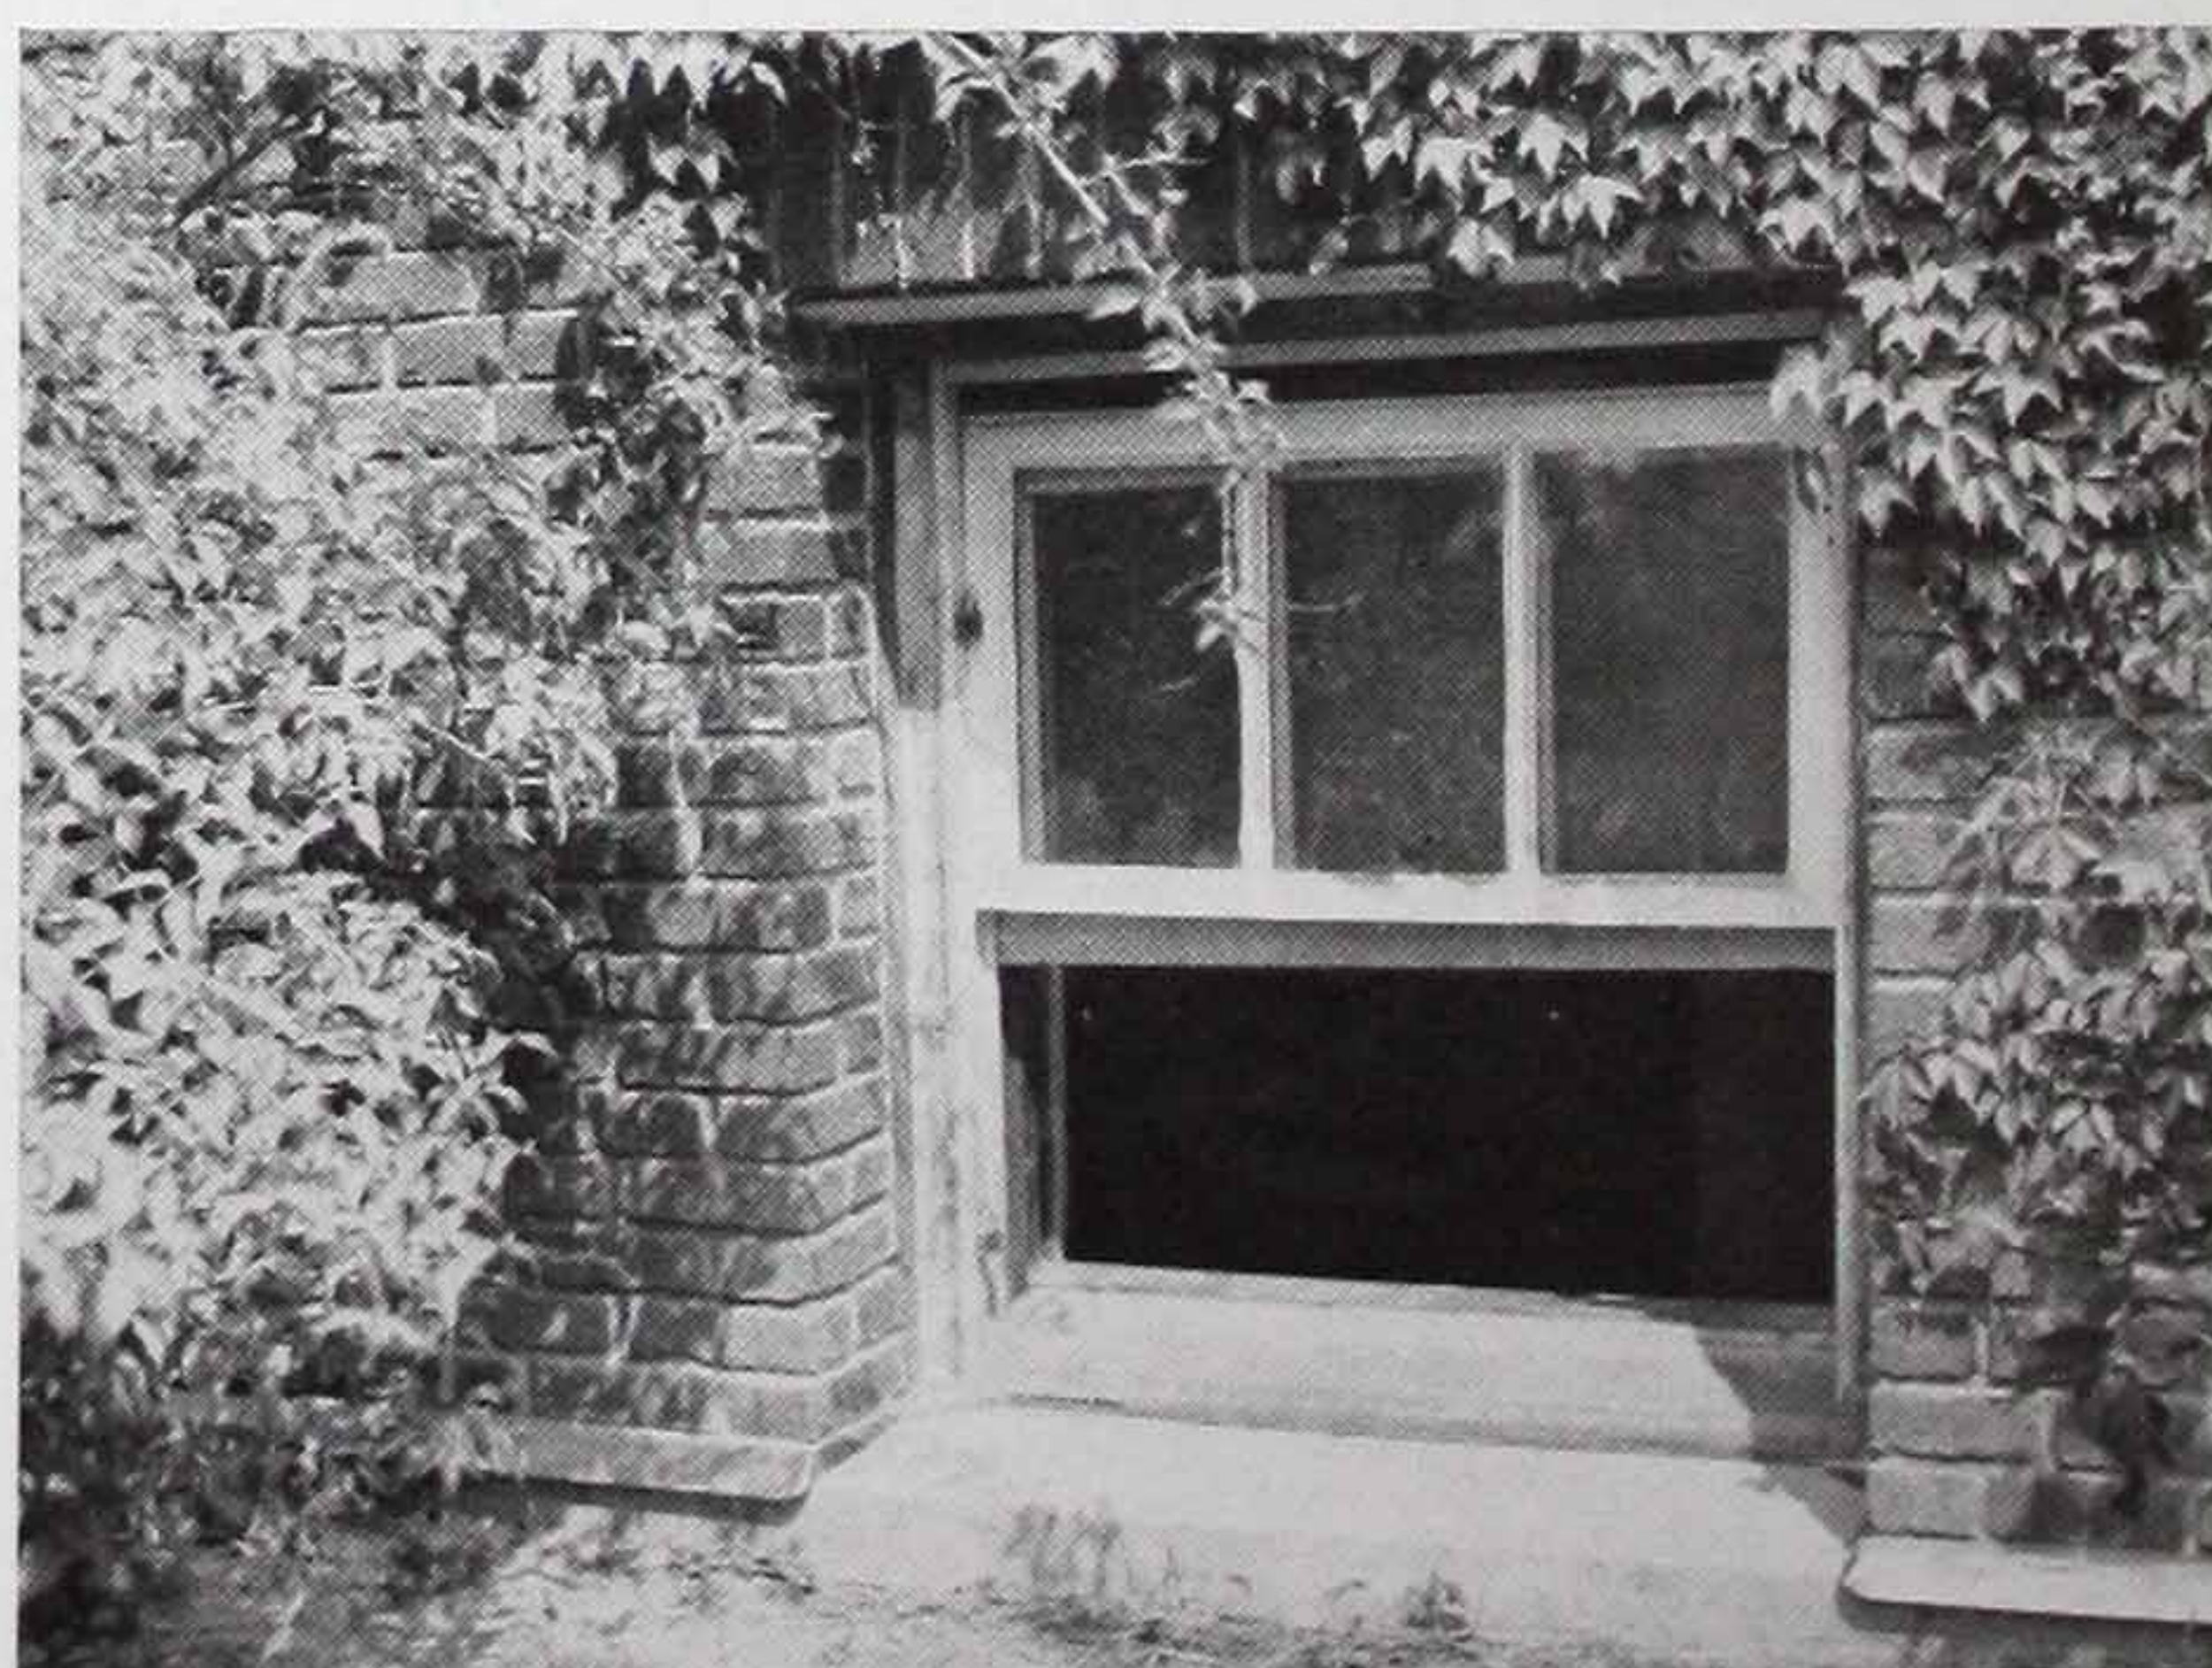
shows details of a typical cellar hatchway. It will be noted that this construction combines Barrier with Partial Deflector type of shield. For where the shield extends vertically it is conceivable that shelter tubes might be built around it. But here again we have a point easy of inspection where the Deflector type of
